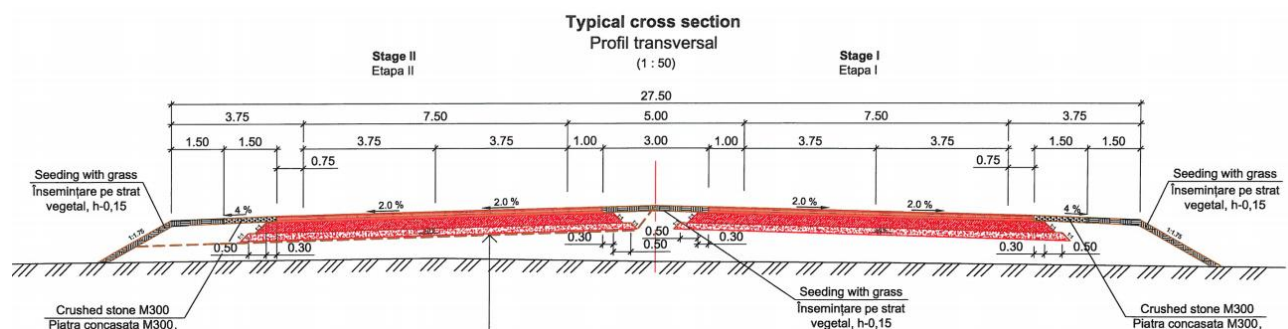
Typical cross section drawing of the road design rehabilitation works
